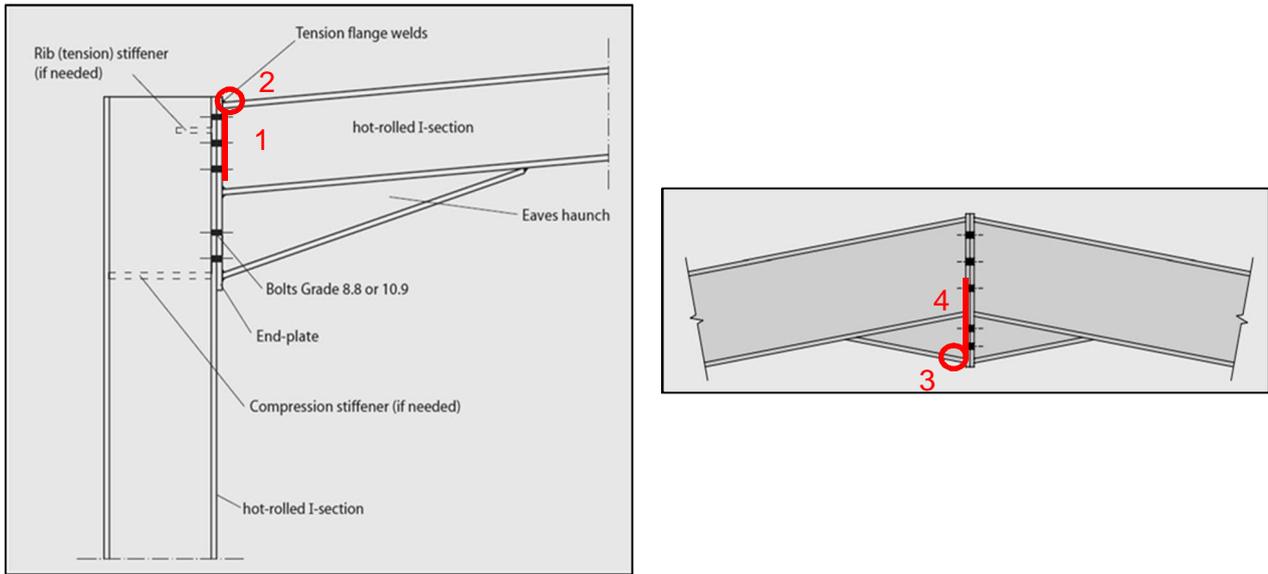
Examples of critical weld details that can be tested.
